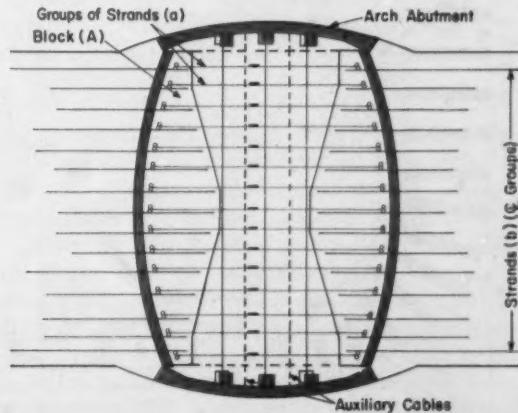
Prestressing of pavement gaps is facilitated by arching abutments against shoulders in main slab.
